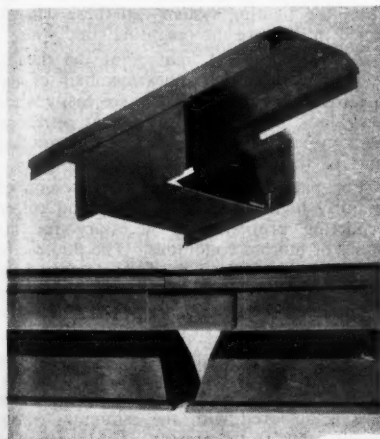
Top-coupling piece. Bottom — coupling piece in position.
